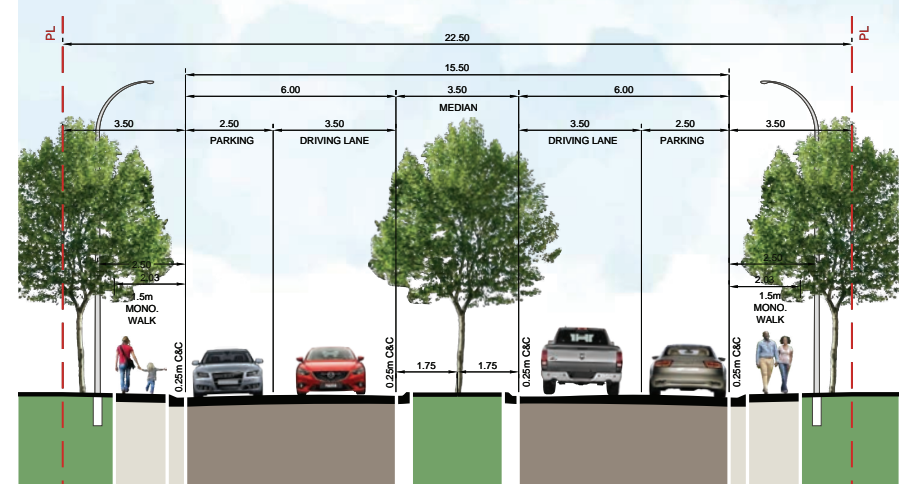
ROAD SECTION | LOOPED RESIDENTIAL ROAD – 22.5M
